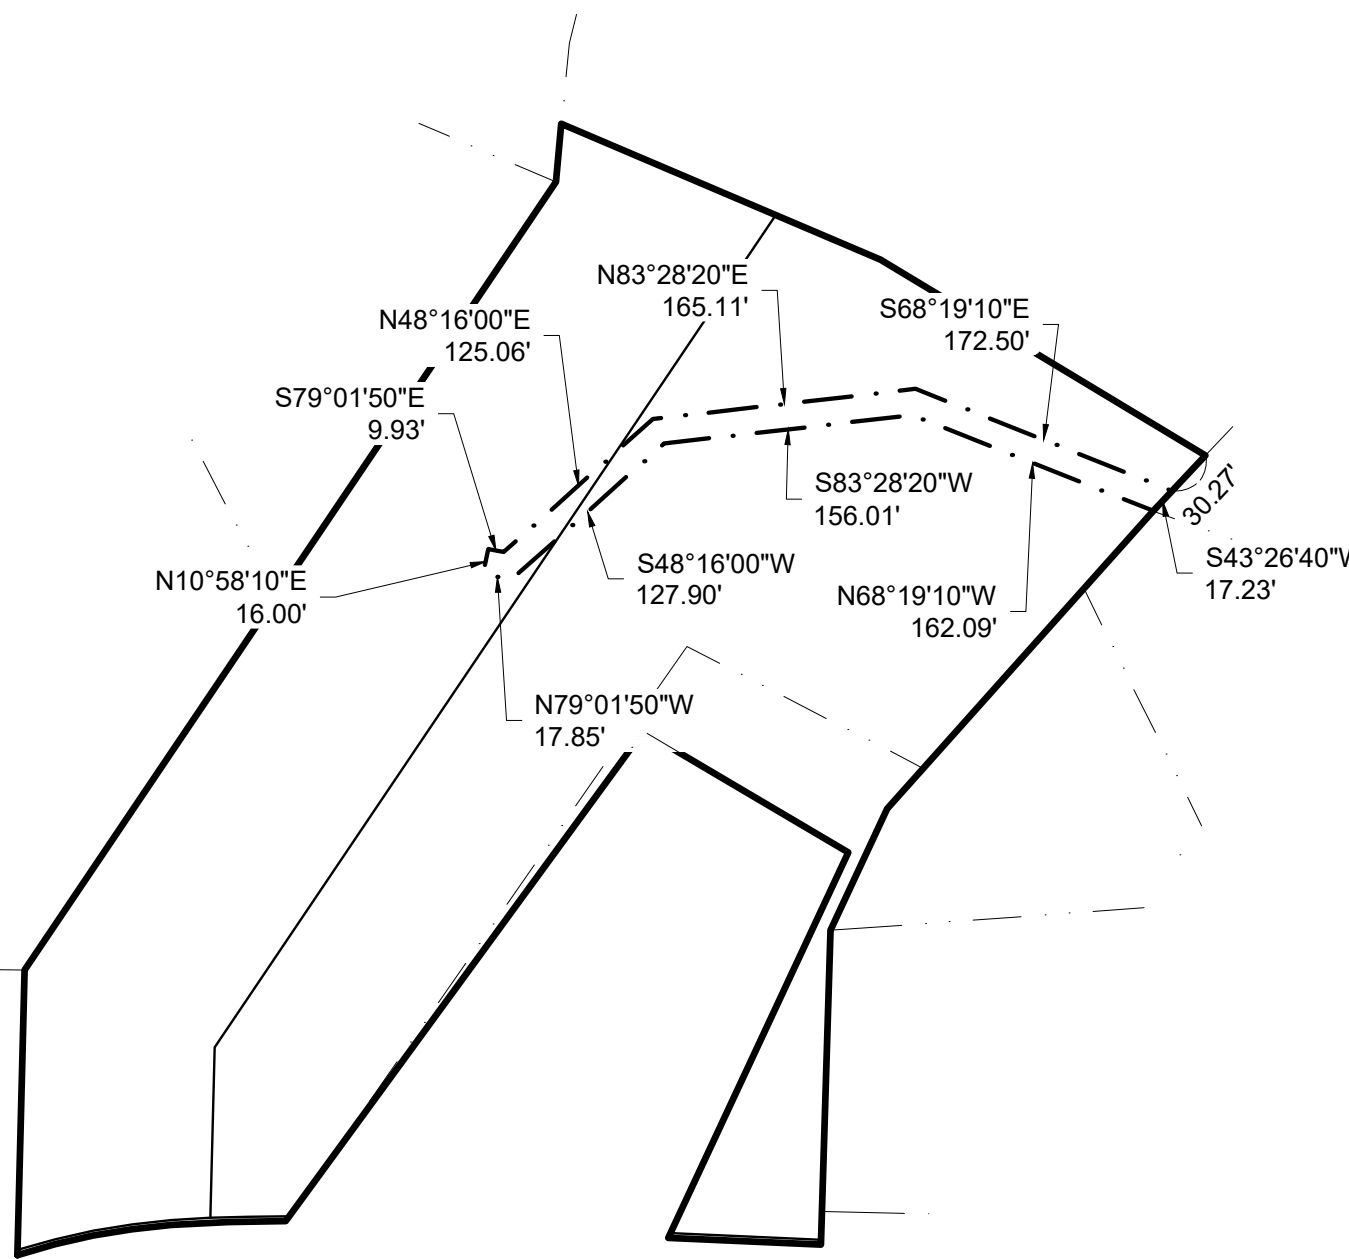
DETAIL 'A' - SEWER EASEMENT - BK 3766 PG 131
